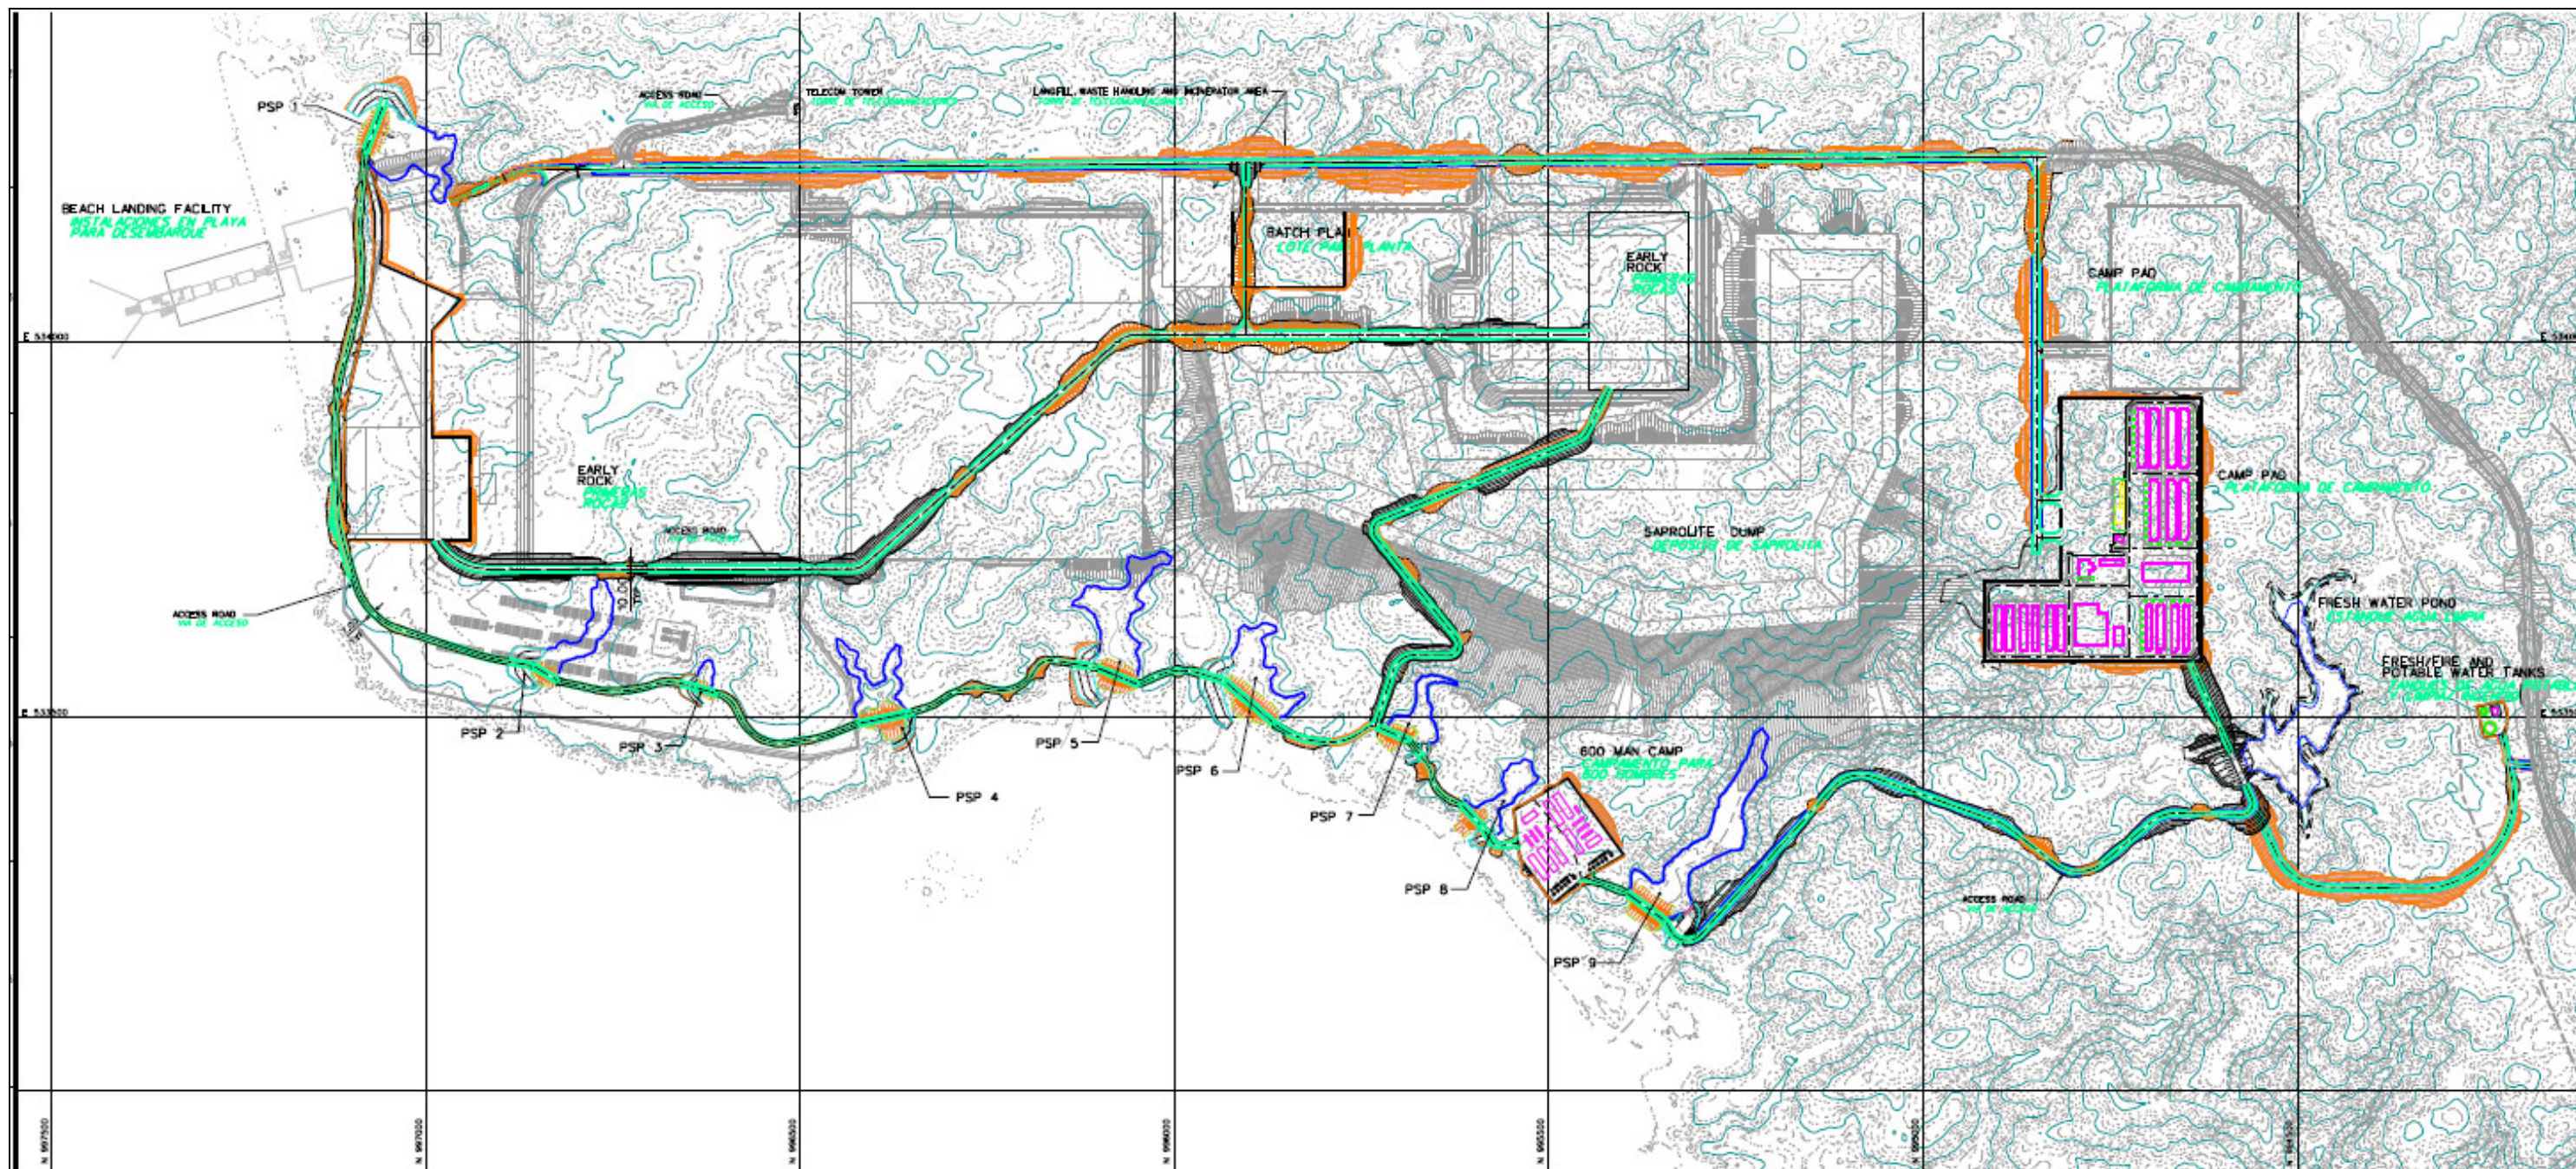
3: Port Site Plan (Early Works) 504832-6200-41D1-0001
